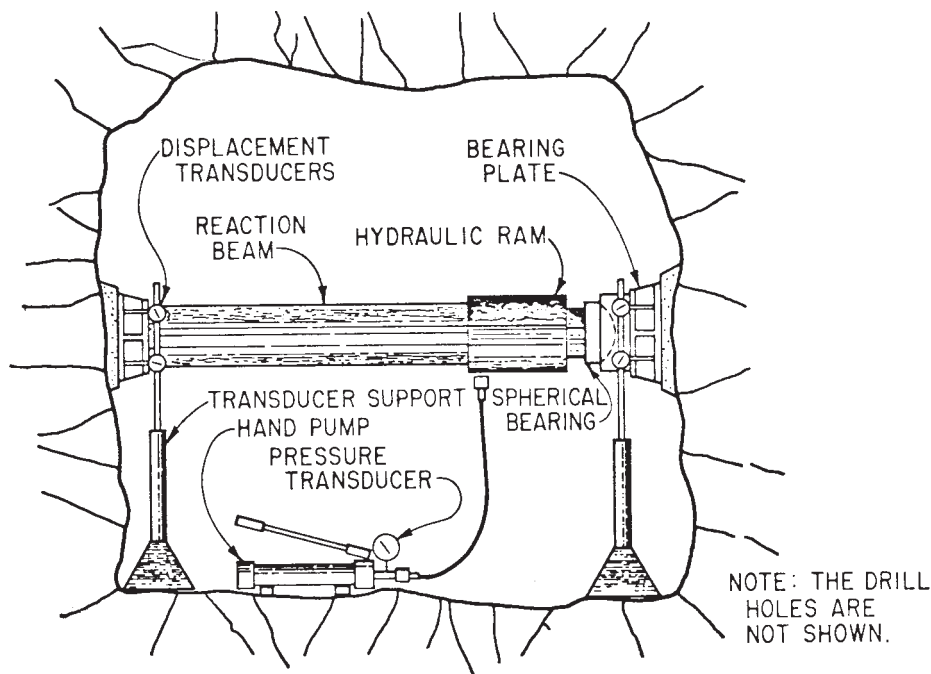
Typical Rigid Plate Bearing Test Setup Schematic
